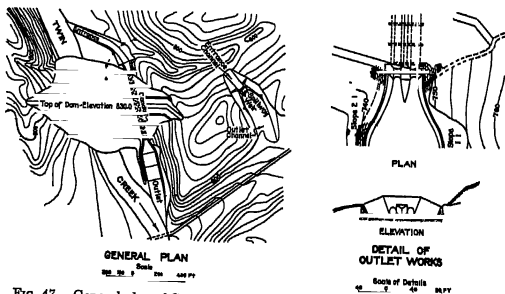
General plan of Germantown dam, outlet conduits, and spillway; and enlarged plan and elevation of lower end of outlet works.—Miami Conservancy District. Here the floods are to be taken through a pair of conduits beneath the dam. An additional free spillway is provided for emergencies.
